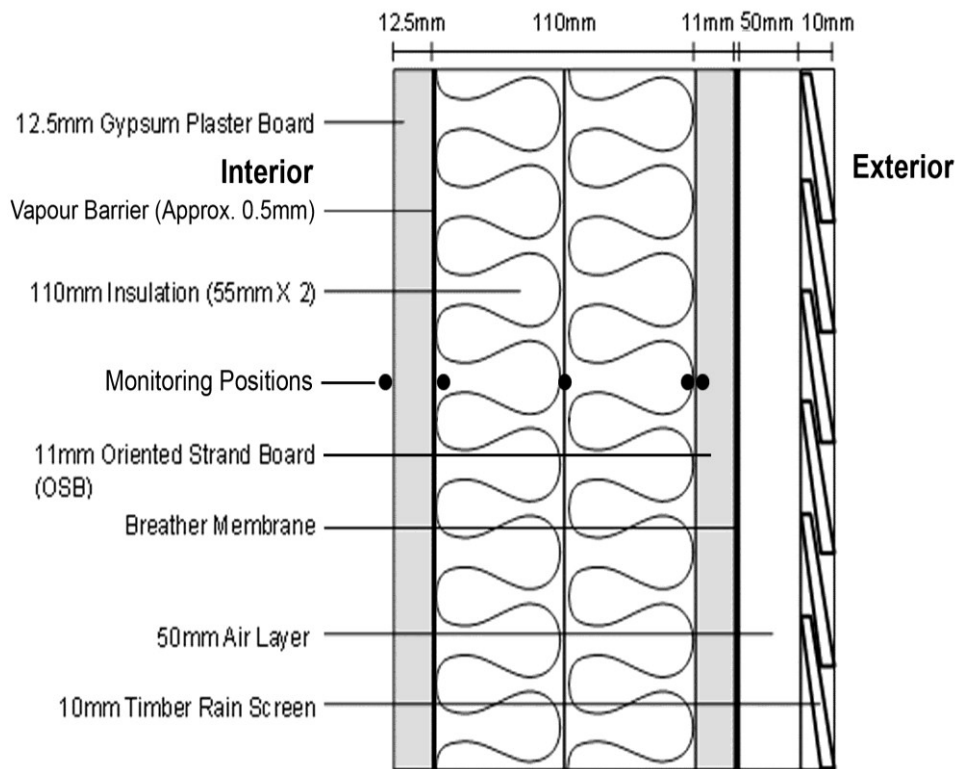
The vertical cross section of the timber frame wall assembly with vapour barrier (wall-2).
